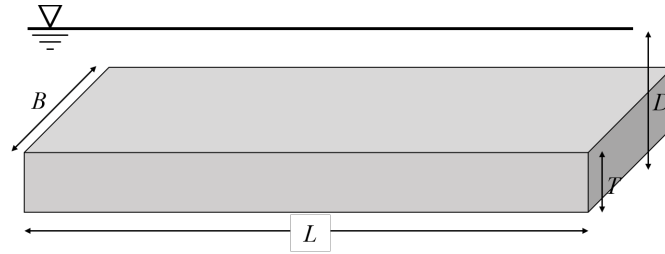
Primary Pile-Cap/Footing Dimensions..
